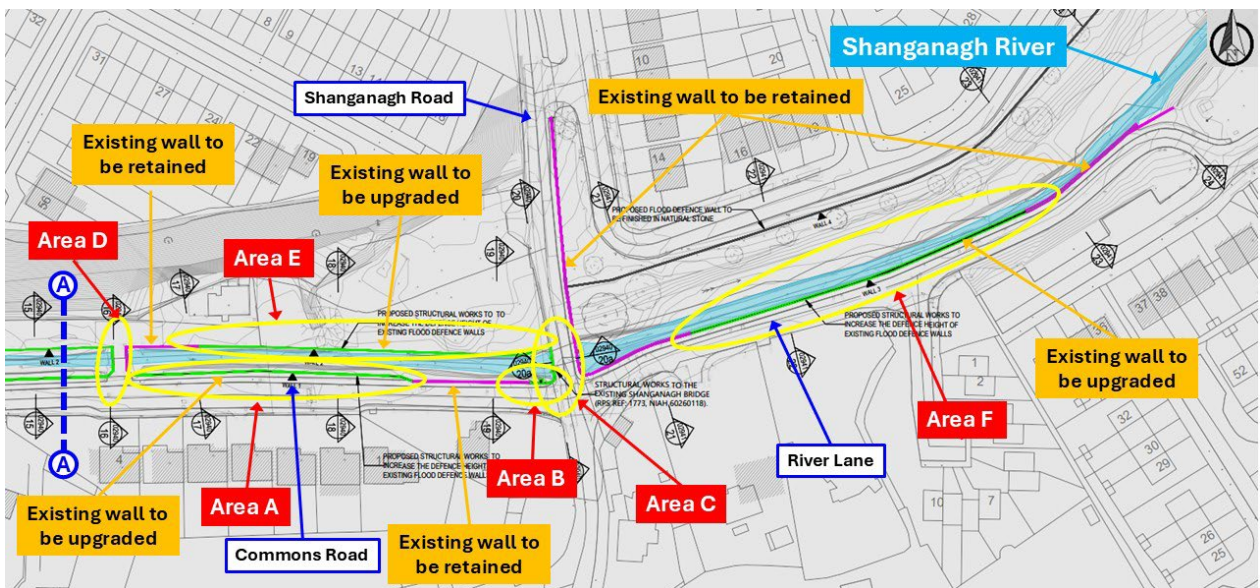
Section of Proposed Works at Commons Road Site (Part 2 of 2)
